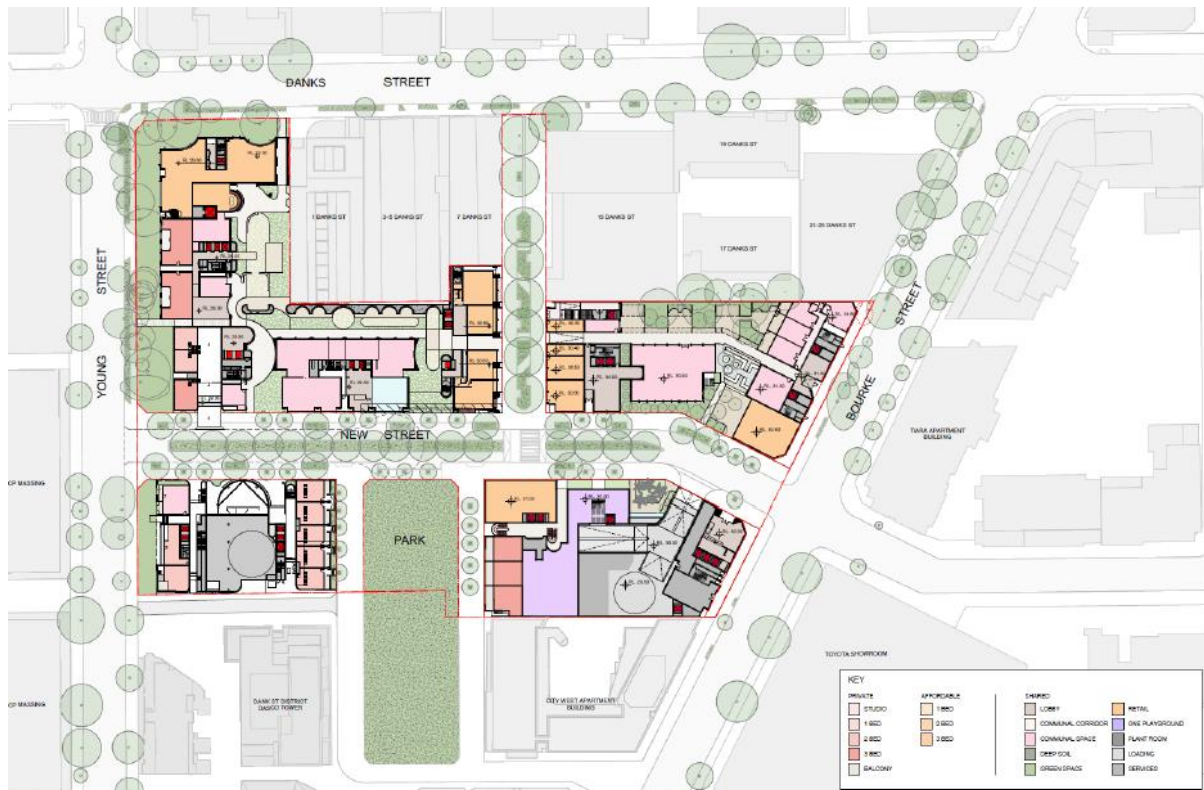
Precinct Plan. Source: SJB Architects, Curious Practice, Bates Smart & Chenchow Little 2025
